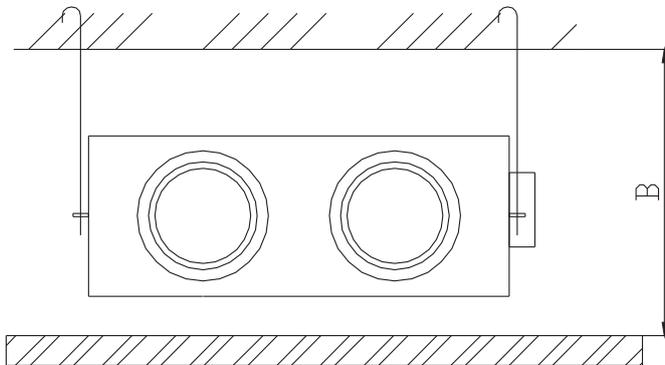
Minimum distance between the ceiling and the suspended ceiling.
